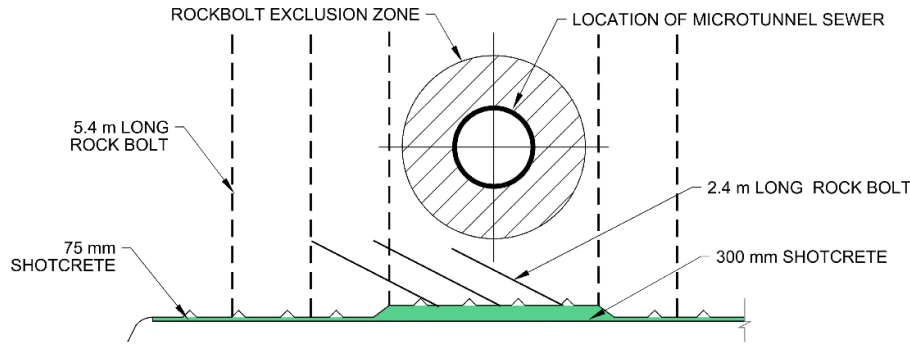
Longitudinal section showing the modified cavern primary support below the sewer trunk
